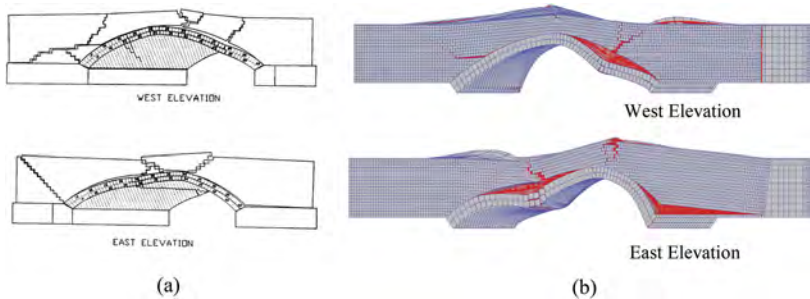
Skew Bridge 3-3 (Hodgson, 1996); West Elevation (top) and East Elevation (bottom); (a) experimental failure mechanism; (b) deformed shape at failure.
